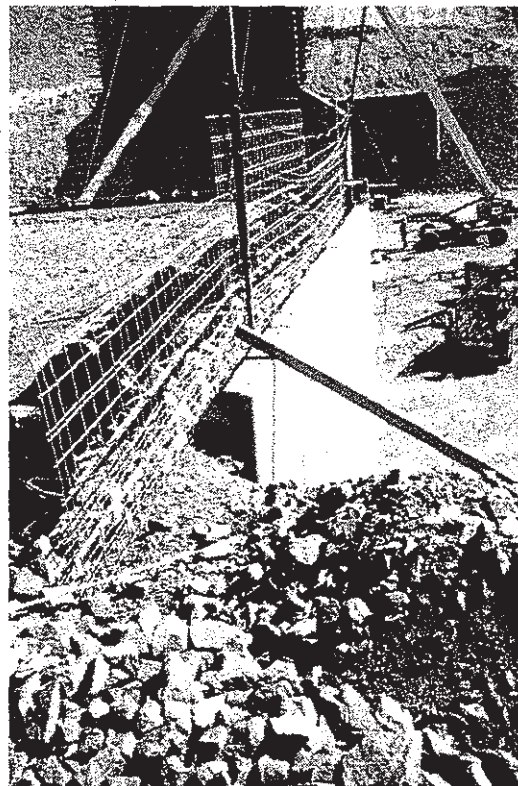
Transition from precast concrete to wire facing. Note finish grading to be required to protect bottom of wire facing.
